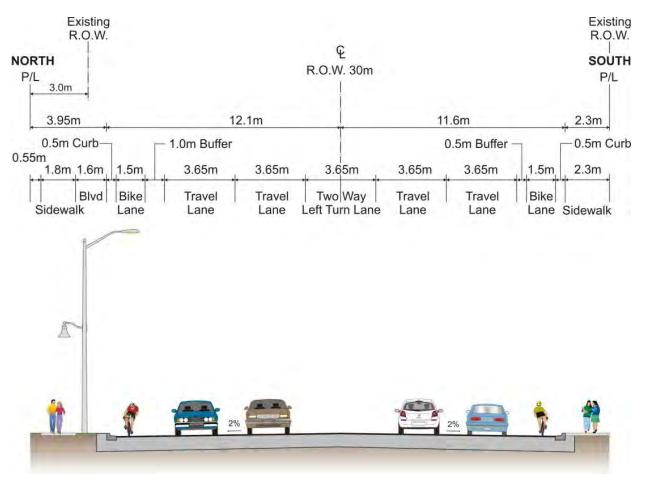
PIC 2 TYPICAL CROSS-SECTION COUNTY ROAD 42 SHIFF DRIVE TO ST. ALPHONSE AVENUE
